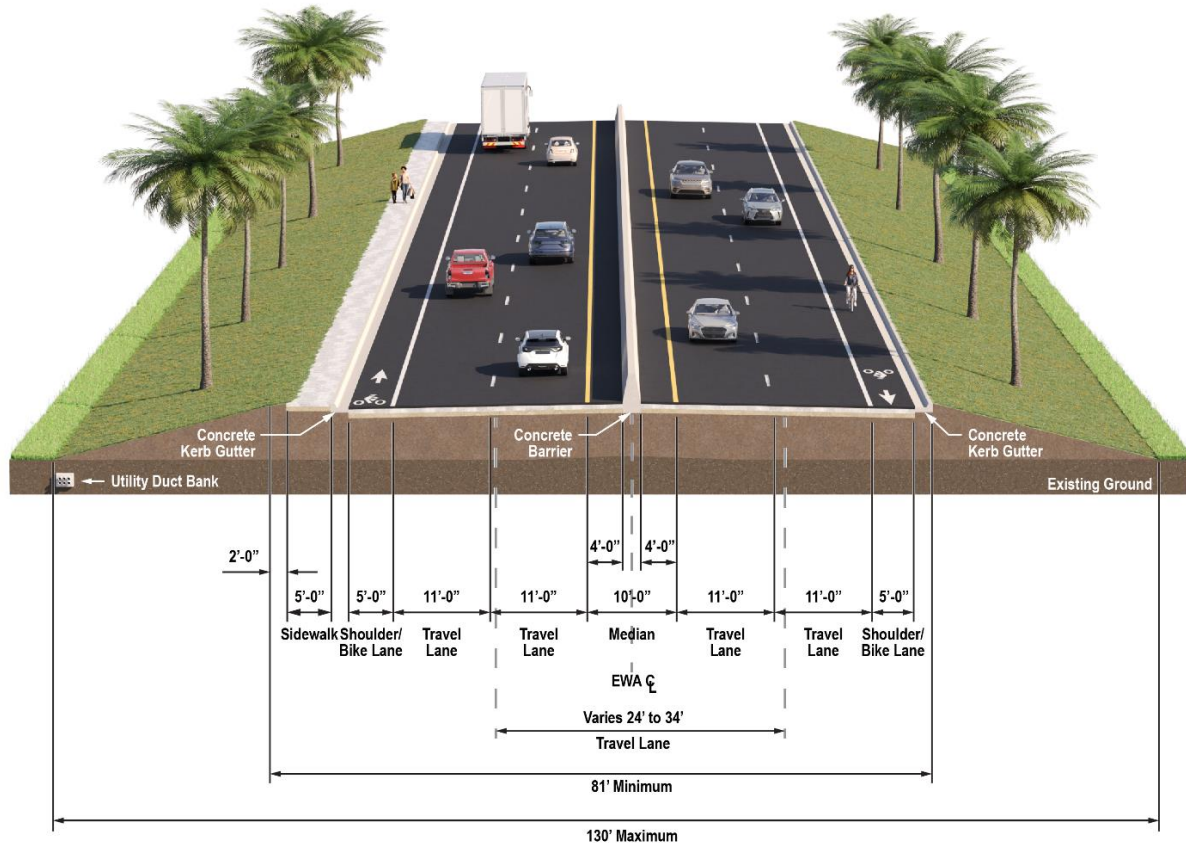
Alternative B4 Typical Section for 2026 (Lookout Road to Frank Sound Road)
